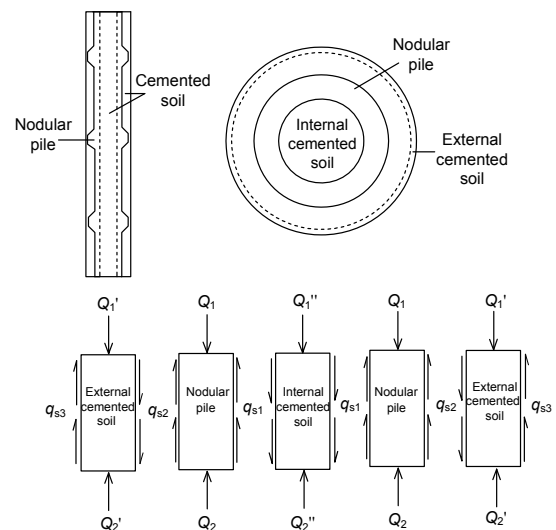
Sketch of nodular pile and load transfer path of a pile element
